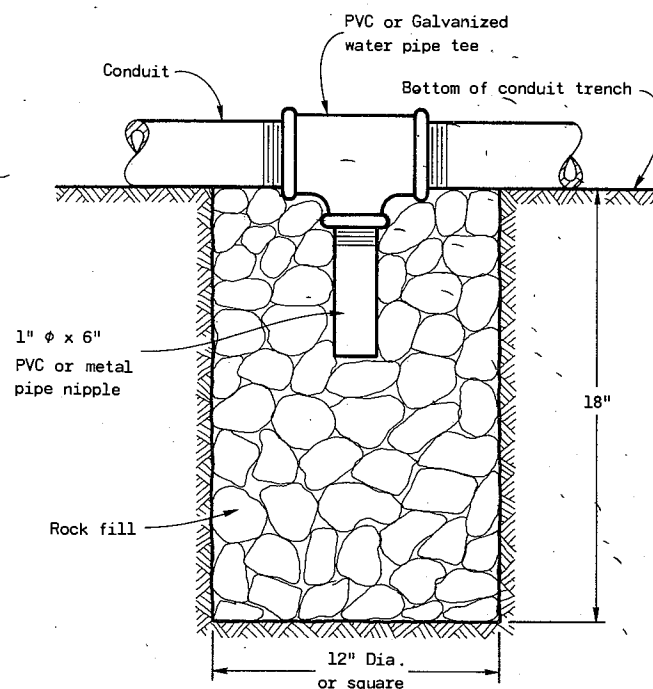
DETAIL FOR TRAFFIC SIGNAL CONDUIT FOR DIVIDED OR UNDIVIDED HIGHWAYS
